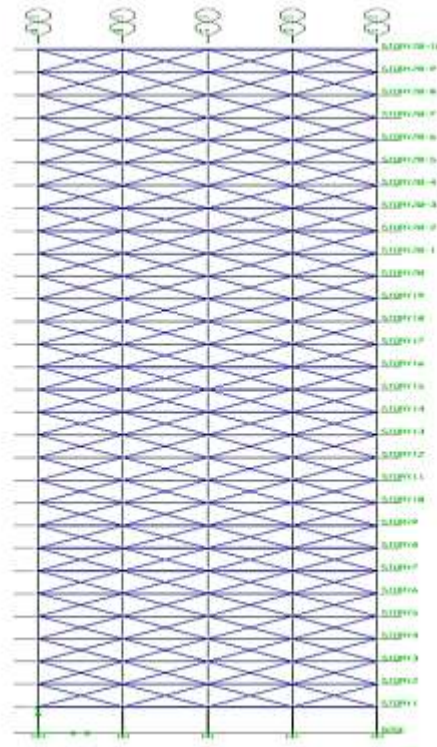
Elevation of 20 - Storey building with strut
